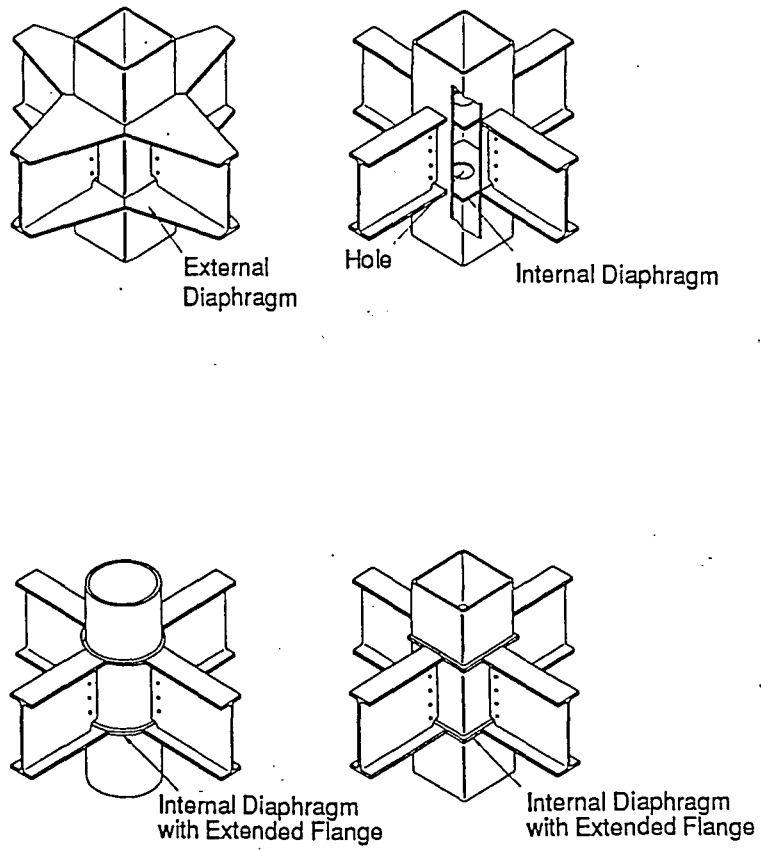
Typical CFT Column-to-Beam Connections [AIJ, 1987]
